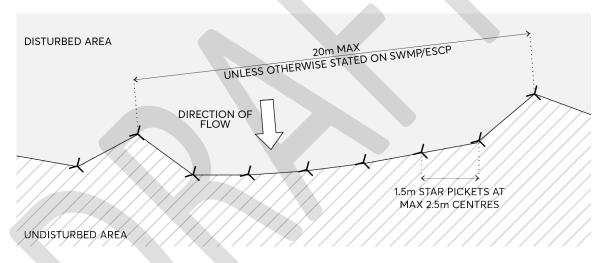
Plan - Sedimentation fencing (Source: Soils and Construction: Managing Urban Stormwater, Landcom, March 2004)
